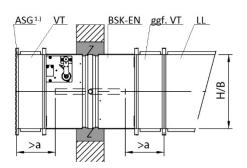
Connection example of a ventilation duct arranged on one side and a finishing protective grating
